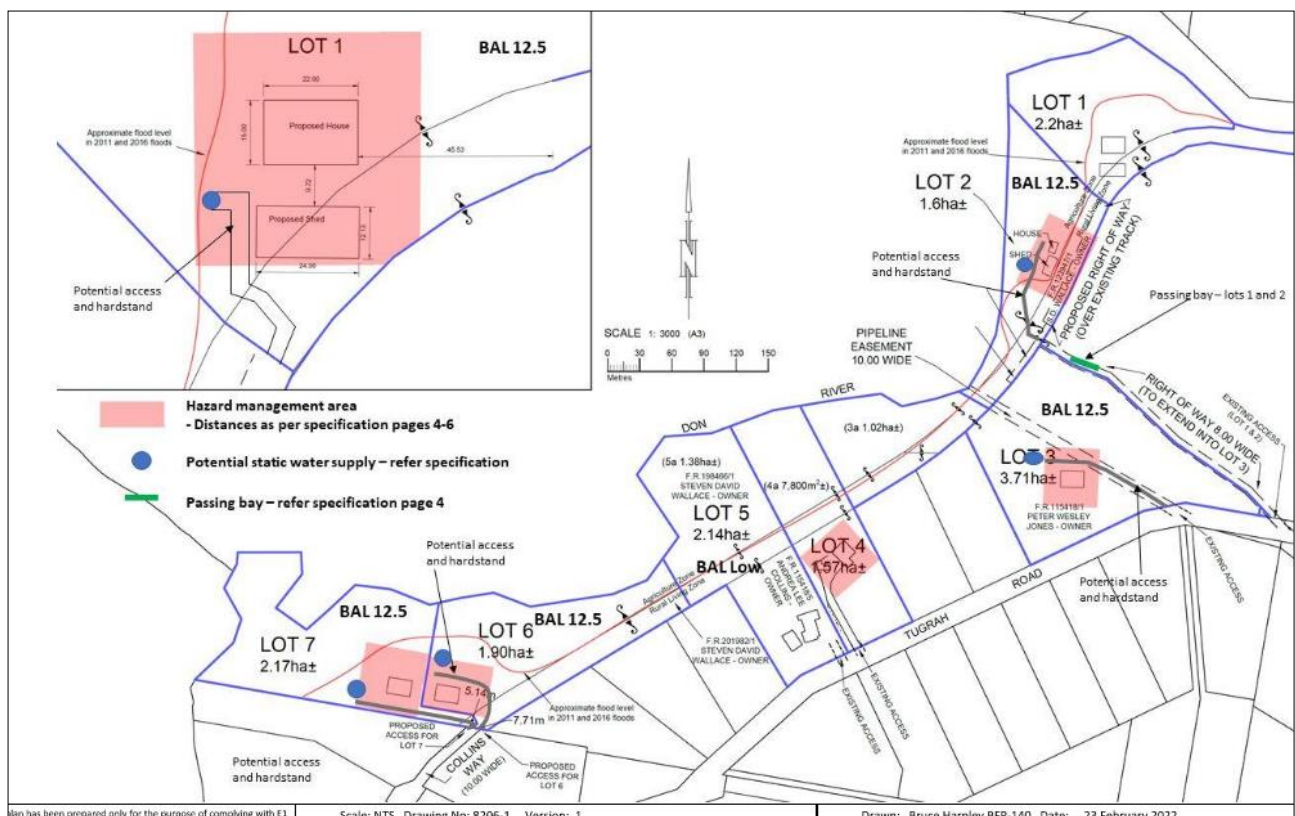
Bushfire Hazard Management Plan (Harpley, 2022)
